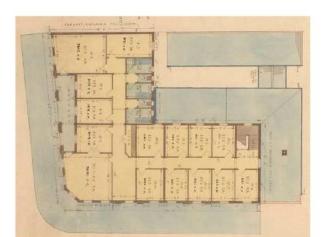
The Ashfield Hotel – Comparative first floor plans
